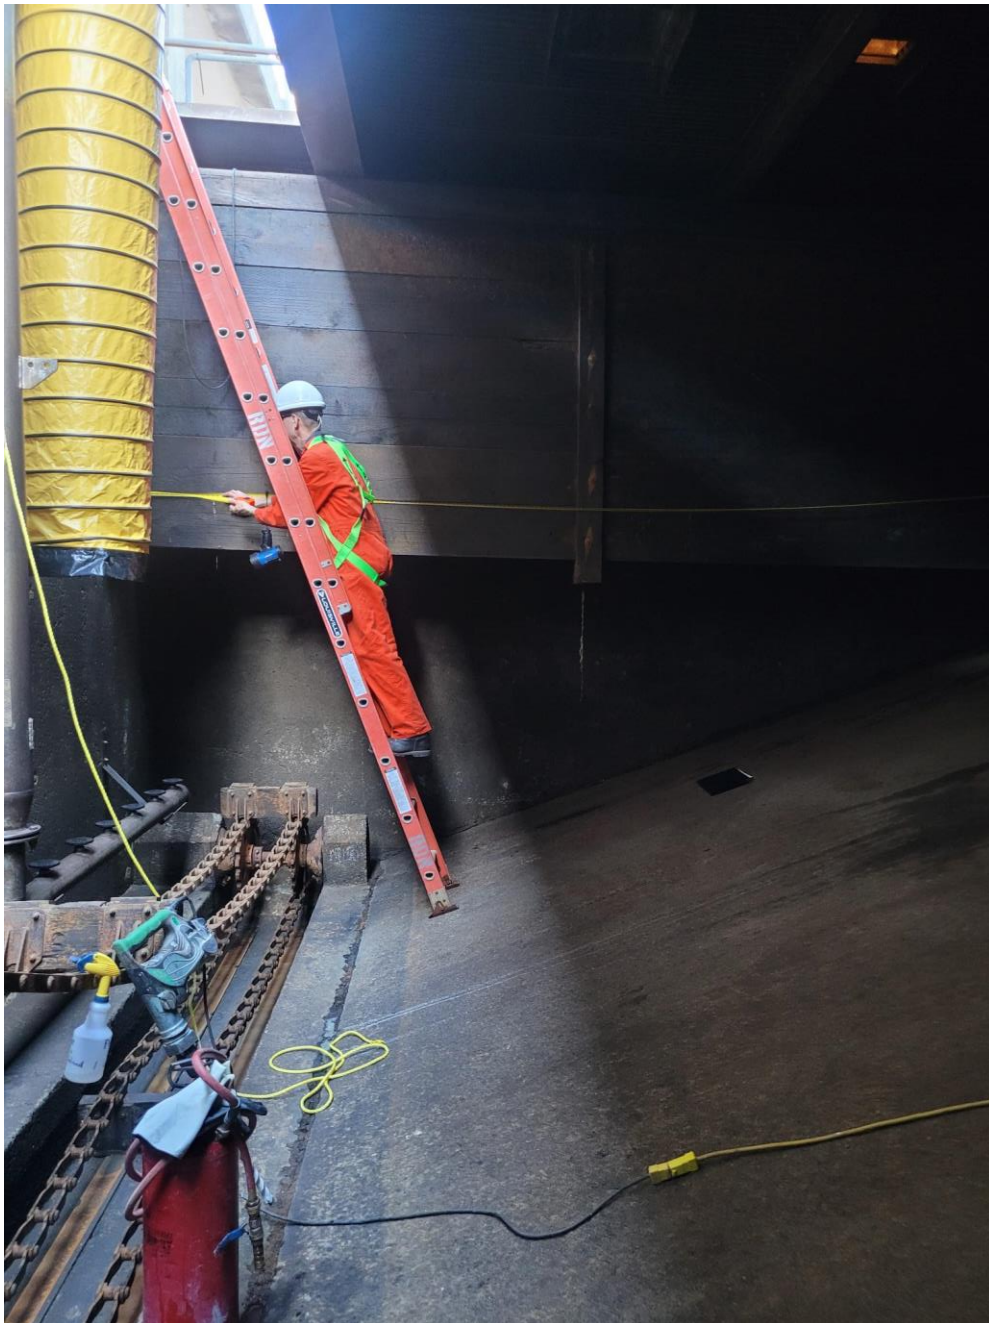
illustrates the South wall of Grit Tank 2 where it intersects the sloping floor. Note the blistering of the coating on the back wall. The floor of the grit tank is uncoated and has typical depth of neutralization of 10 to 12 mm. Refer to Photograph 13 for details of the wall coating.
